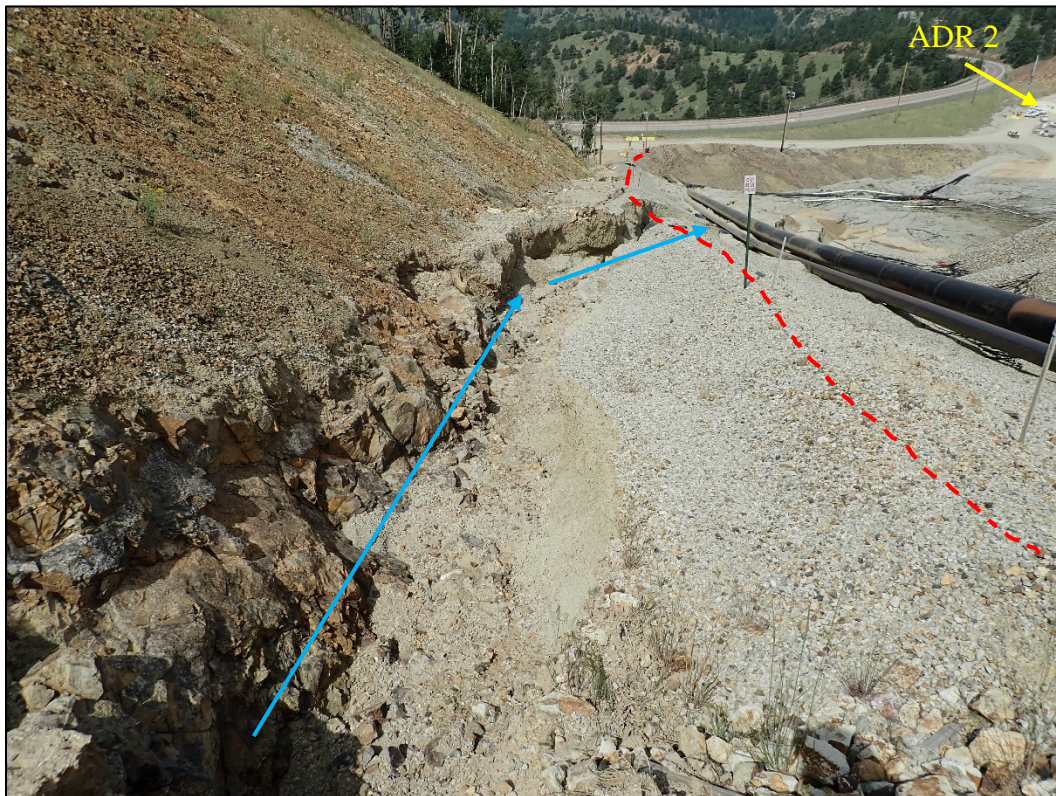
Area where stormwater reentered containment onto VLF 2; looking west.
